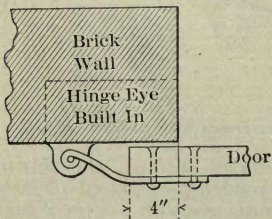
Swing Fire Door Hung to Hinge Eyes.
